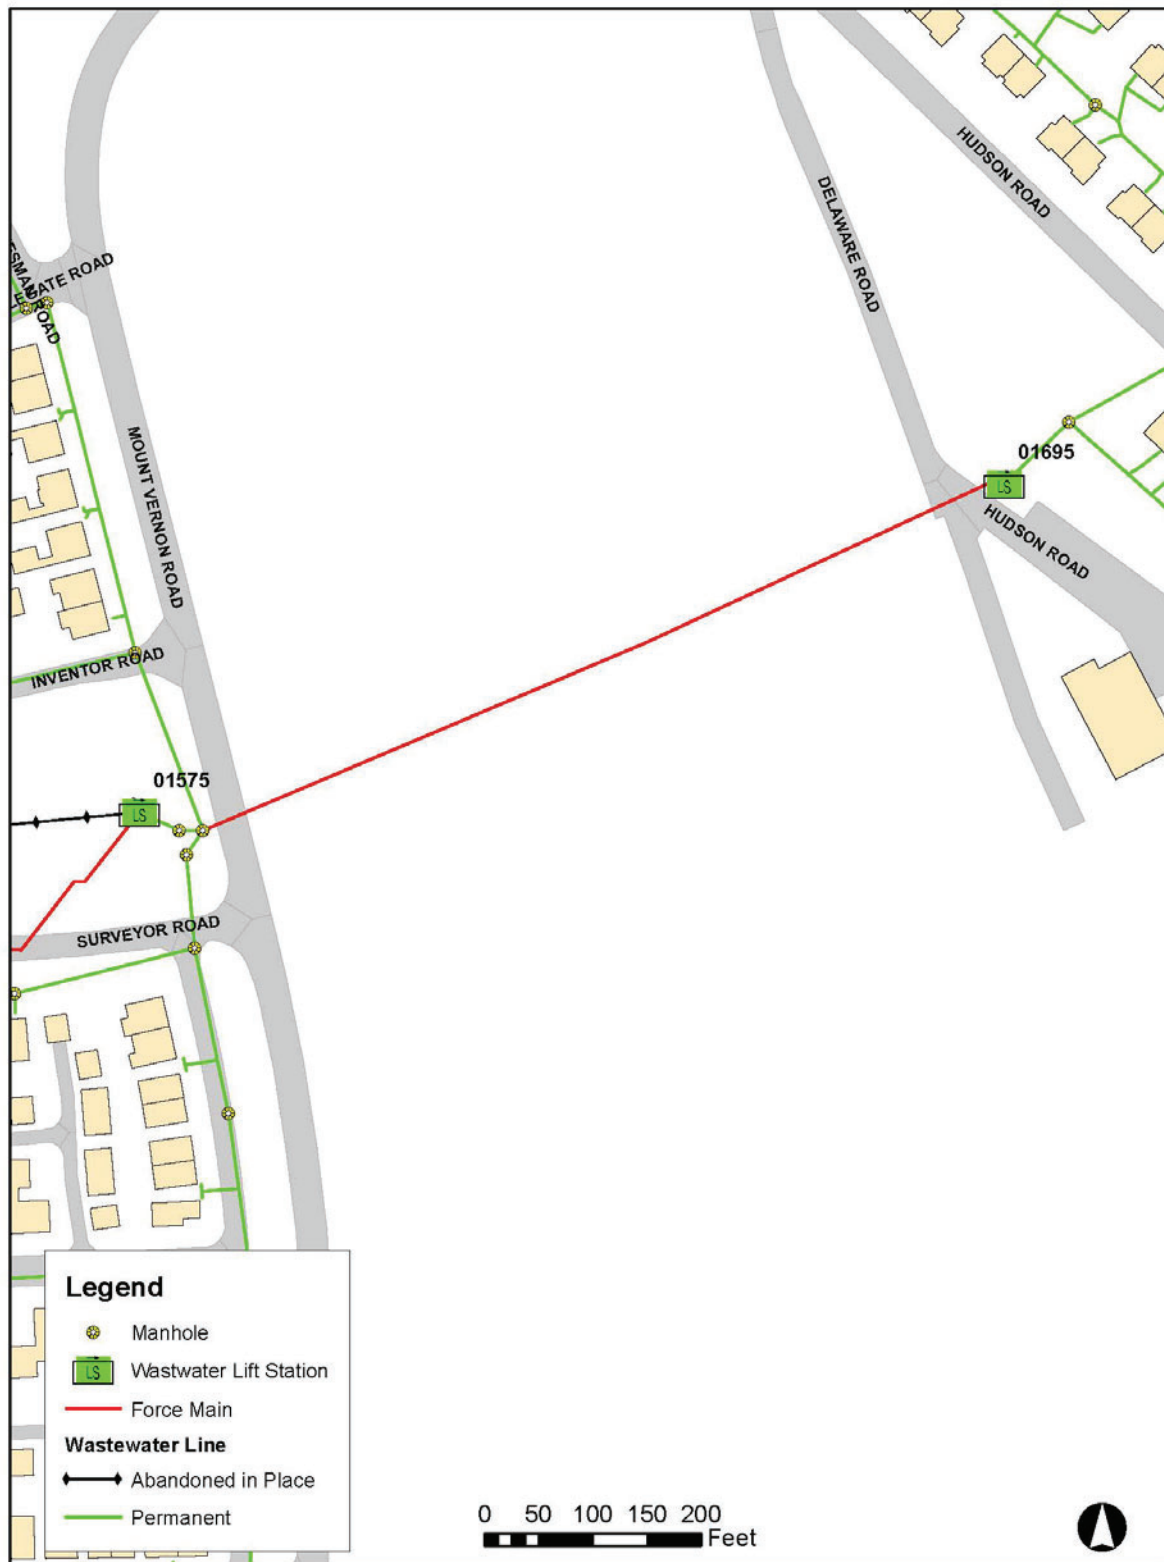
Site Design for Lift Station 1695 River Village to LS1575 George Washington Village
